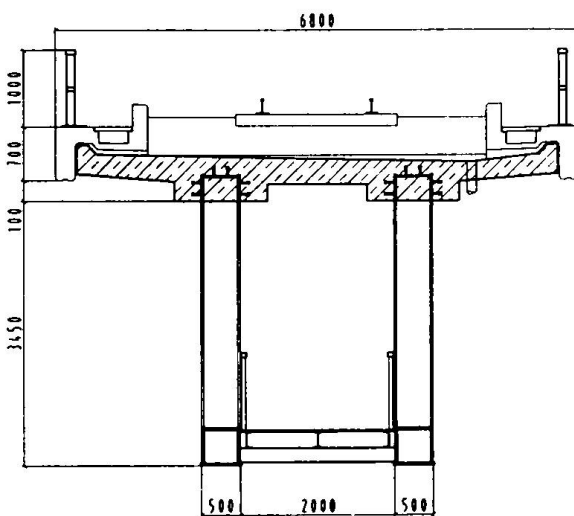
Cross section of railway bridge Siemensstraße/Austria
